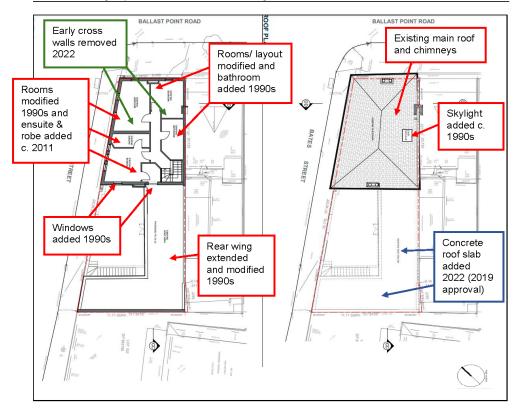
The Second floor layout and roof, 2022. (Base plans by Katris Architects Pty Ltd)
